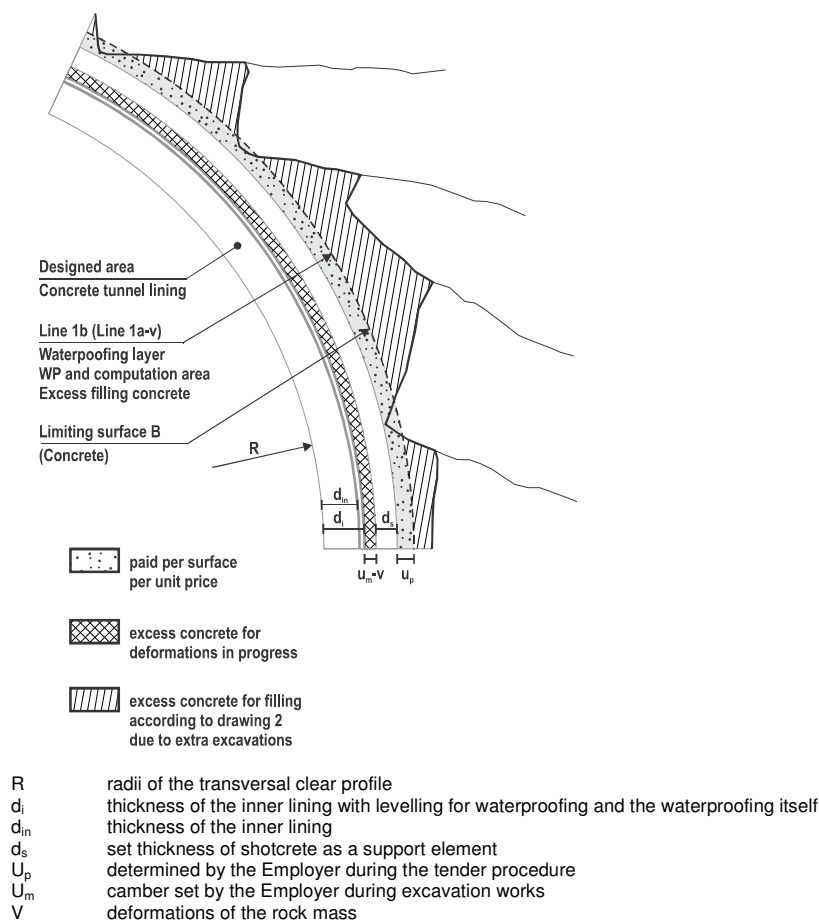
Calculation lines: concrete and excess concrete - layout per deformations
